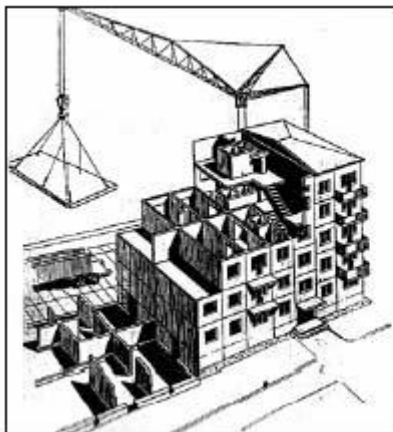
A large-panel concrete building under construction (WHE Report 55, Russian Federation)
